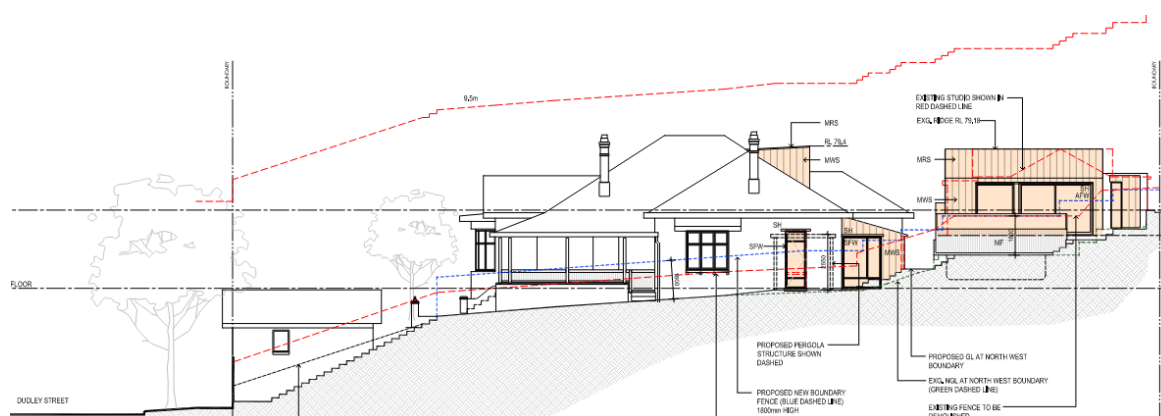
Amended— north side elevation showing at right cabana/pool house, additions to the main dwelling and openings along the northern elevation.
